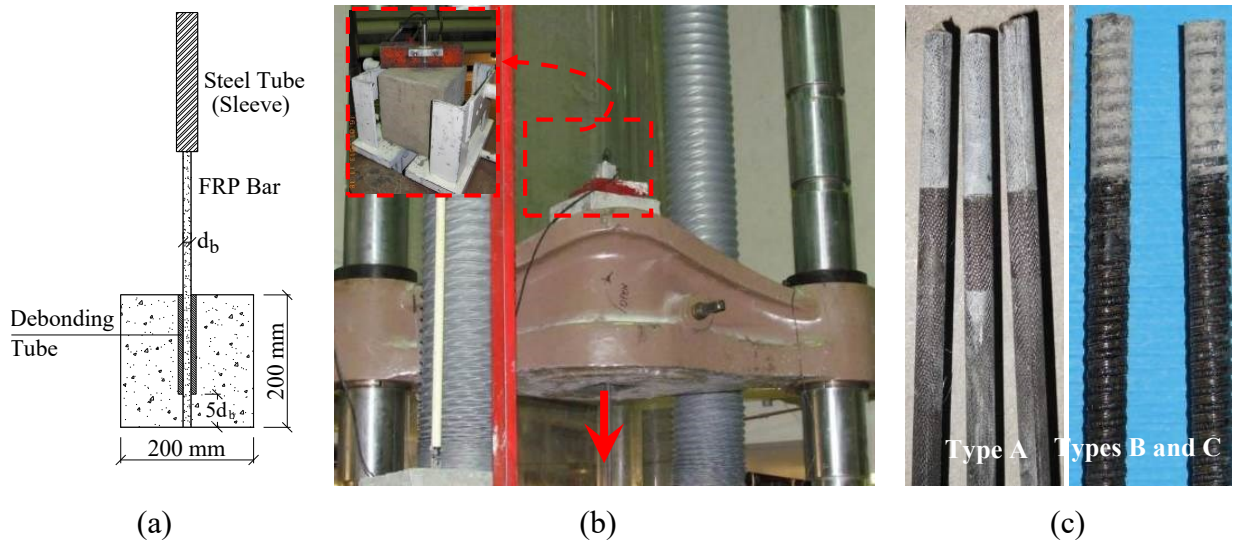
Pullout test: (a) Specimen geometry; (b) Test setup; (c) Typical pullout bond failure
